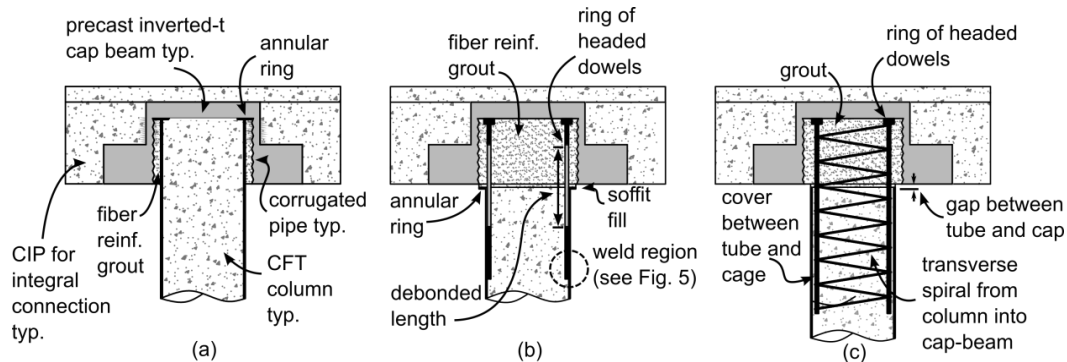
Proposed CFST Column-to-Precast Cap Beam Connections. (a) Embedded Ring Connection (ER), (b) Welded Dowel Connection (WD), and (c) Reinforced Concrete Connection (RC)
